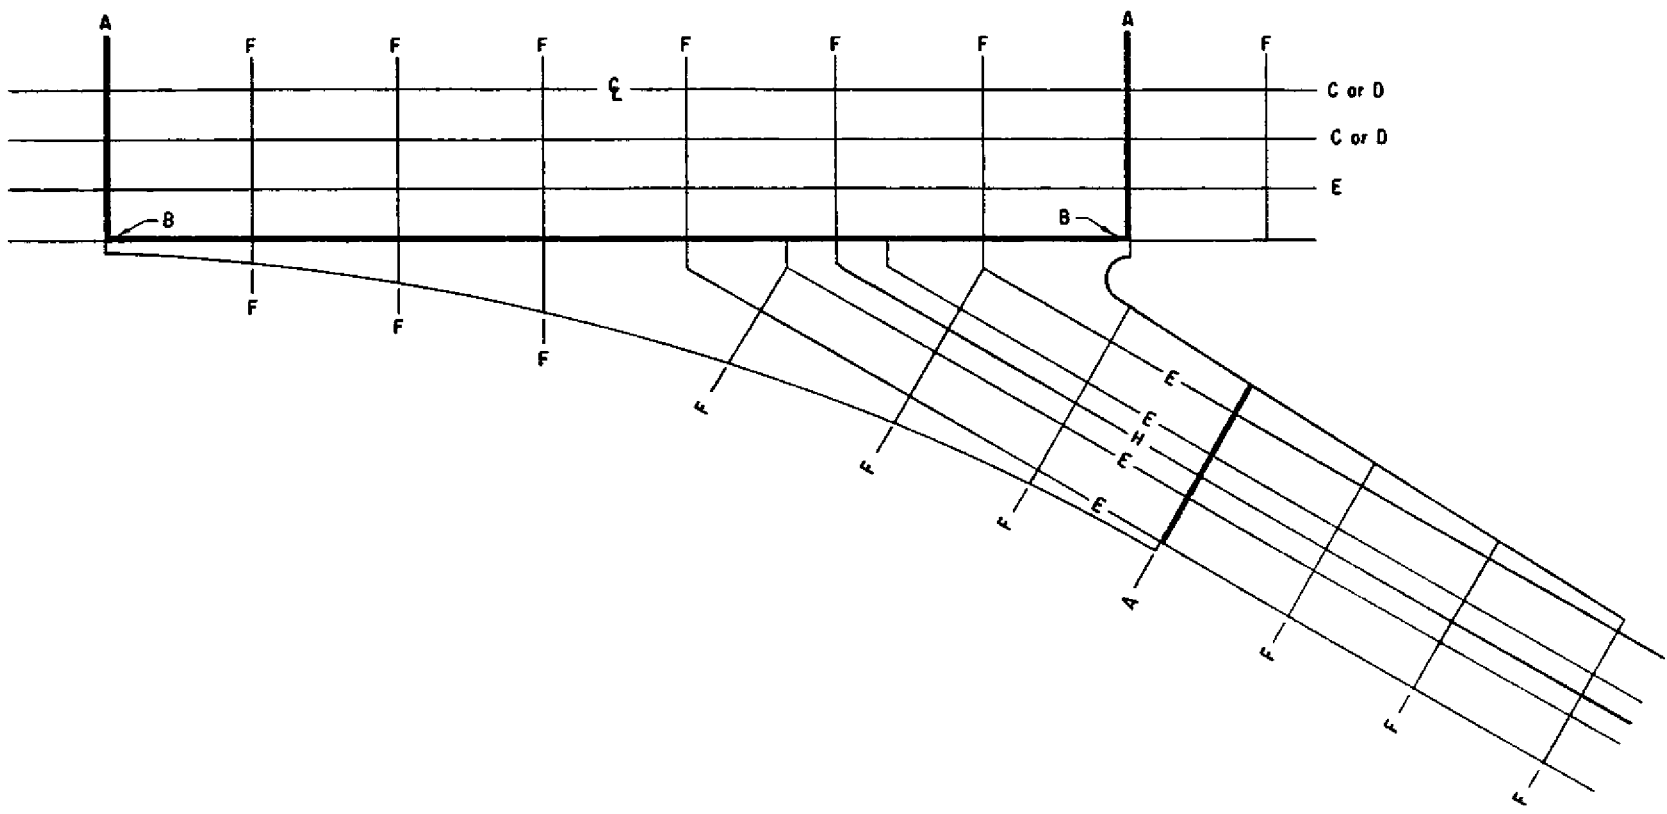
ARRANGEMENT OF JOINTS AT INTERSECTION OF RUNWAY AND TAXIWAY (REINFORCED)
